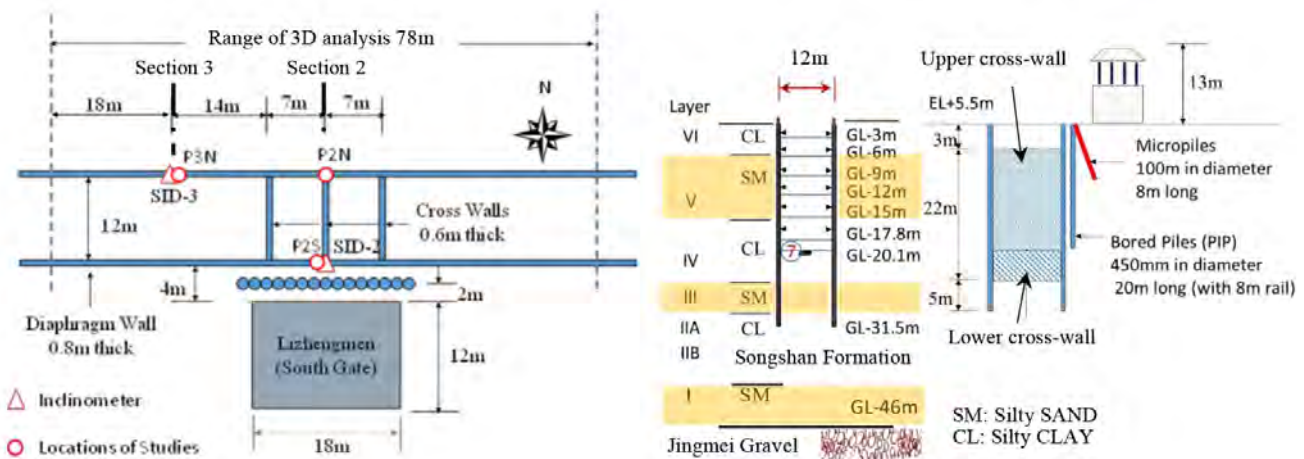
Layout and cross-section of the cross-walls for protecting Lizhenmen and locations of interest
